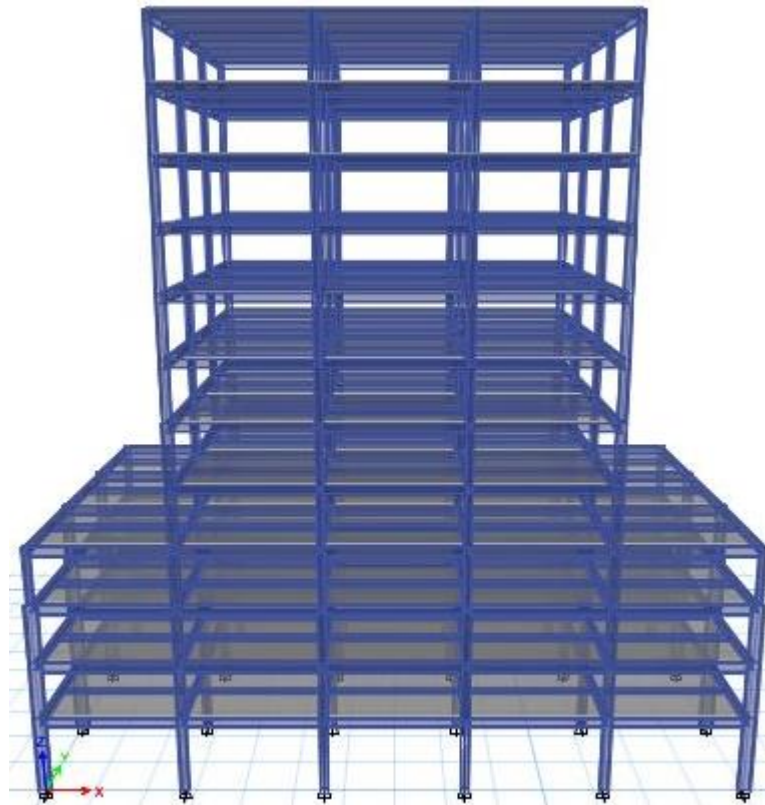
3D view of (1Rx1L) 12 story elevation
